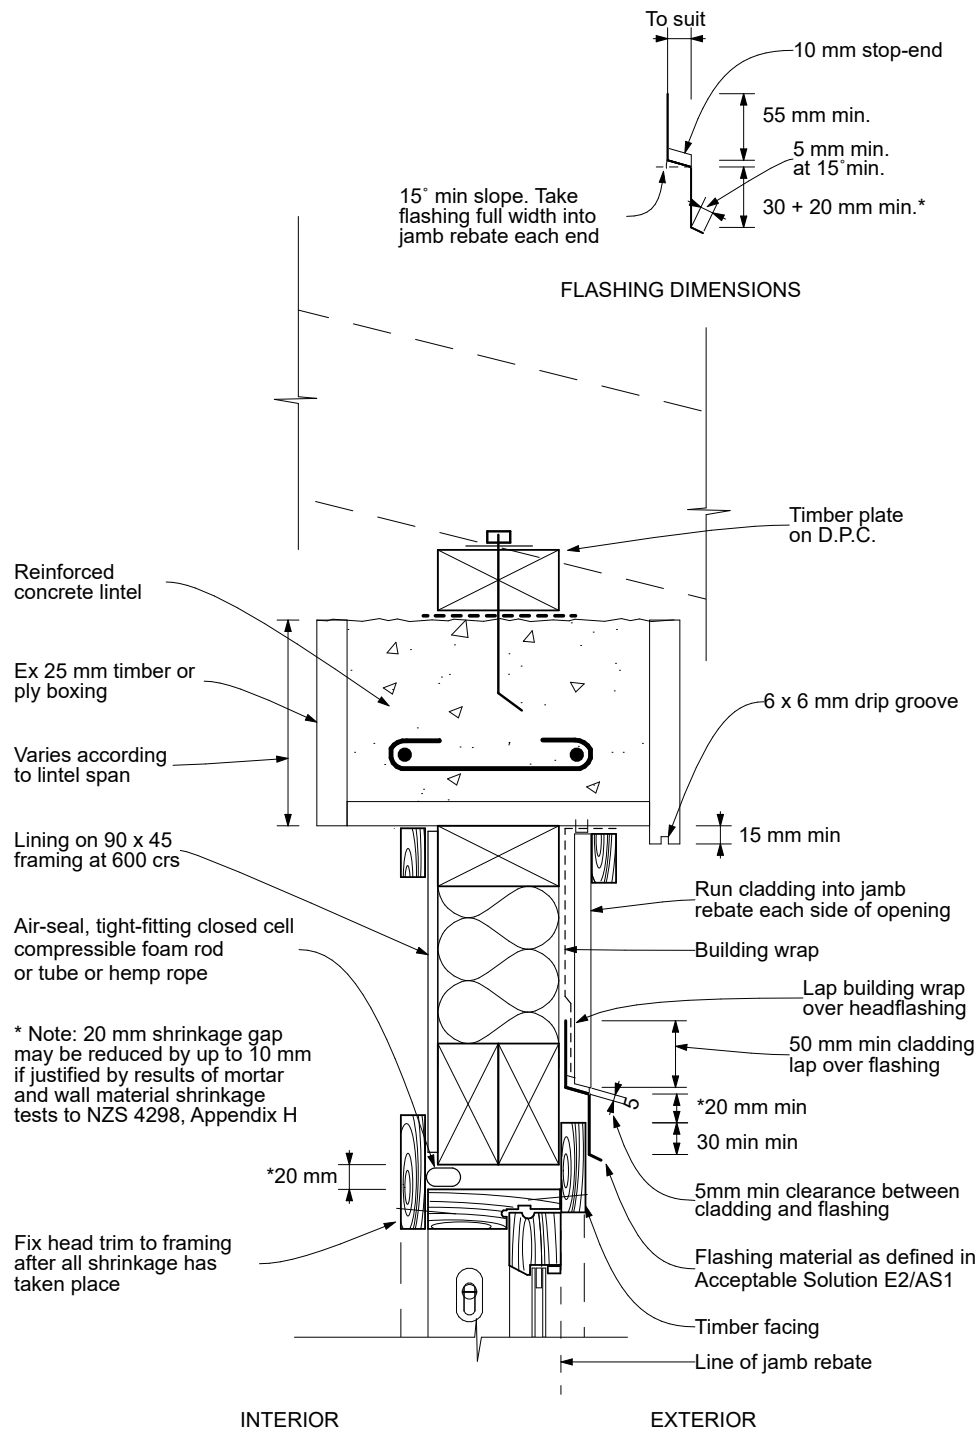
Window head – Timber joinery with timber-framed wall insert
